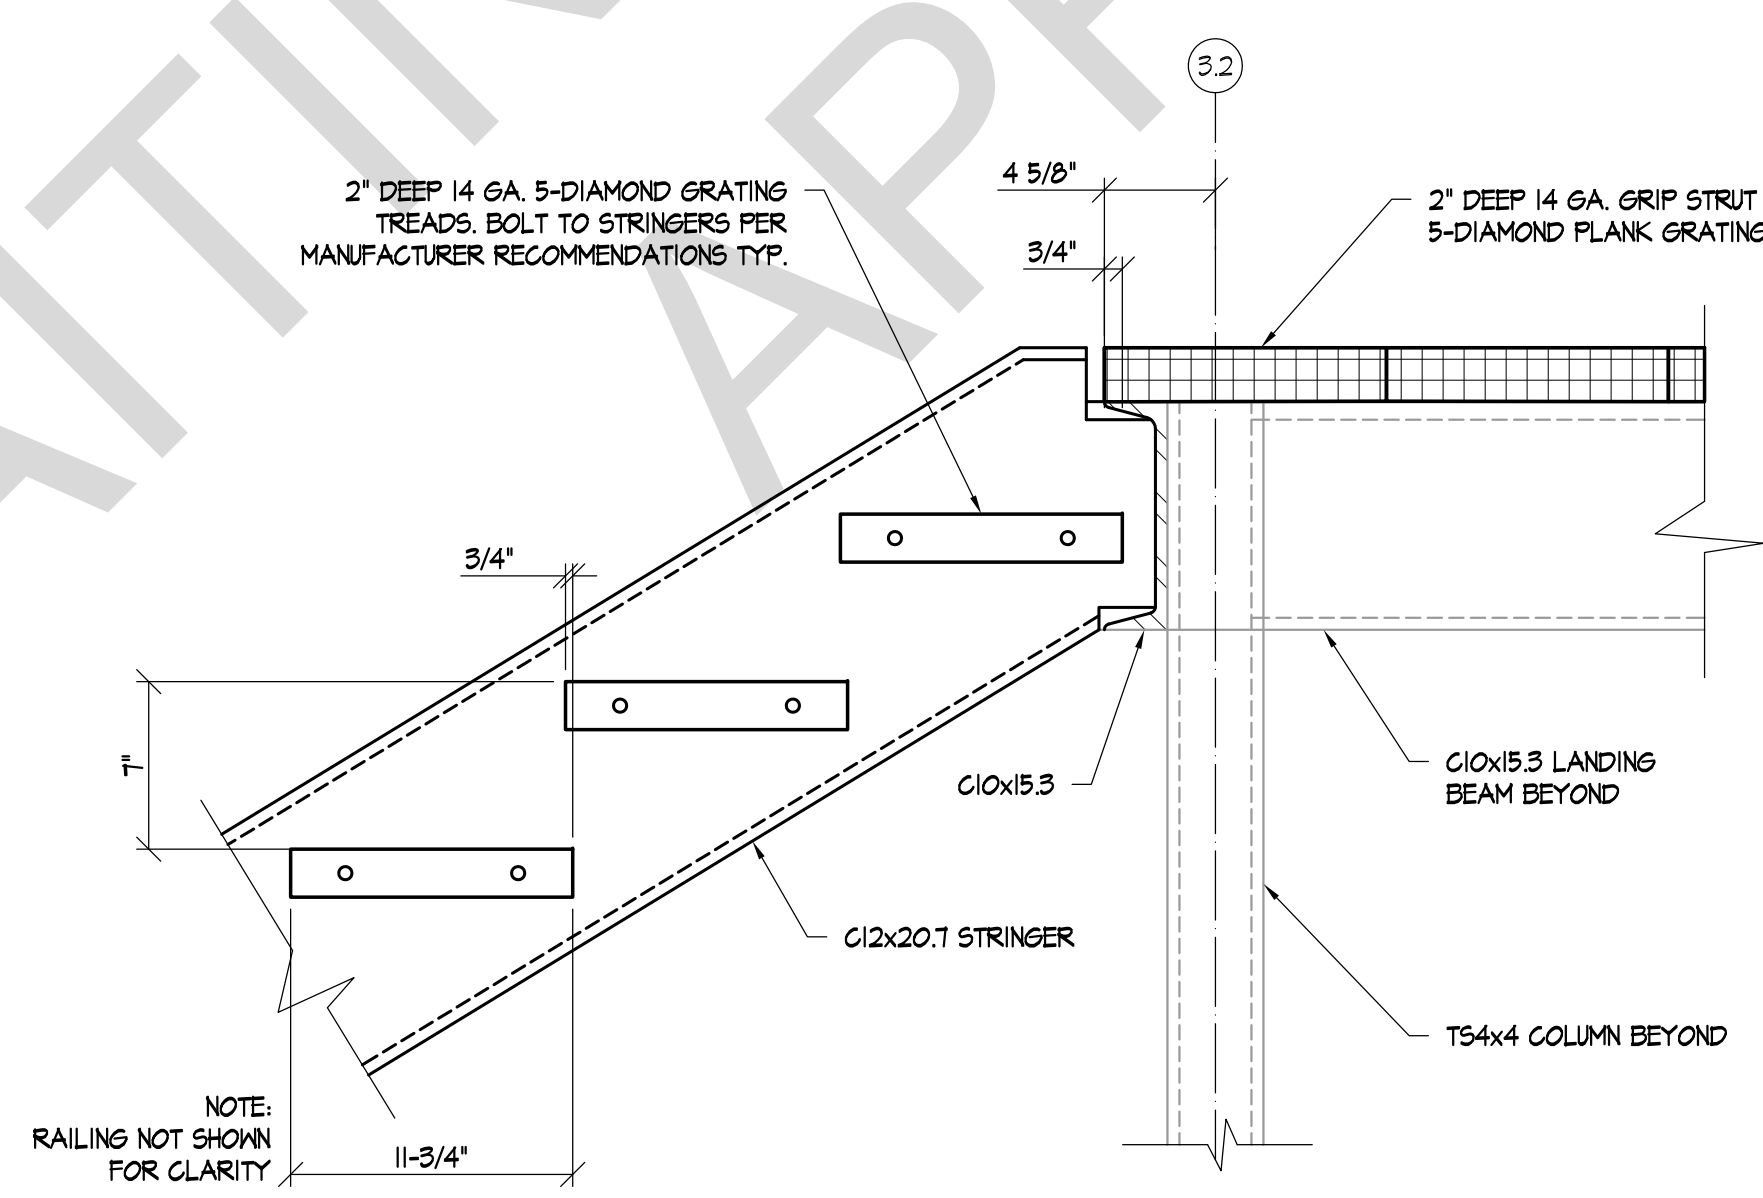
DETAIL STAIR STRINGER SPLICE AND CONNECTION
